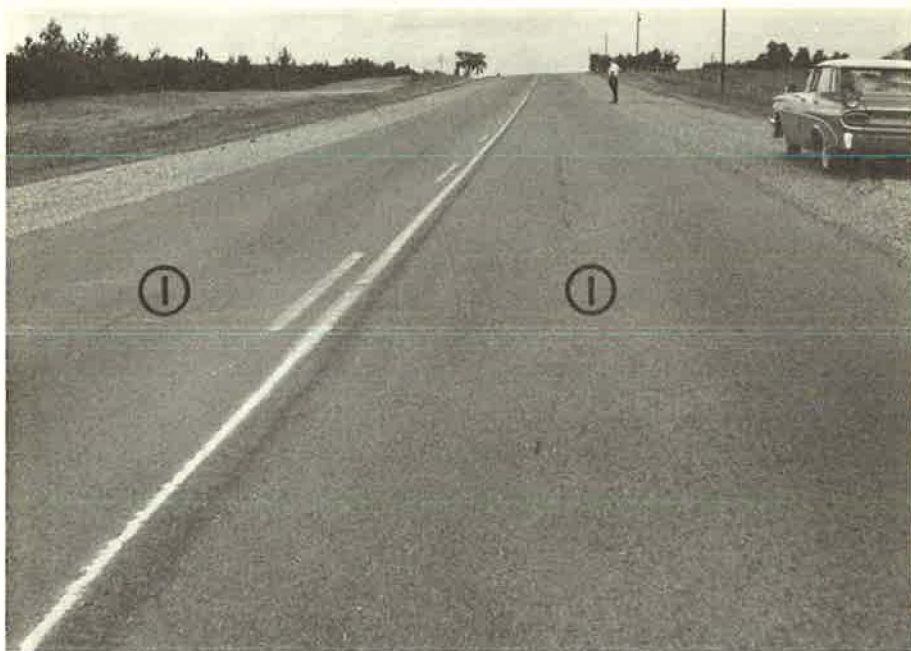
Typical appearance of asphalt pavement containing higher viscosity asphalt-cement (age 8 months).
